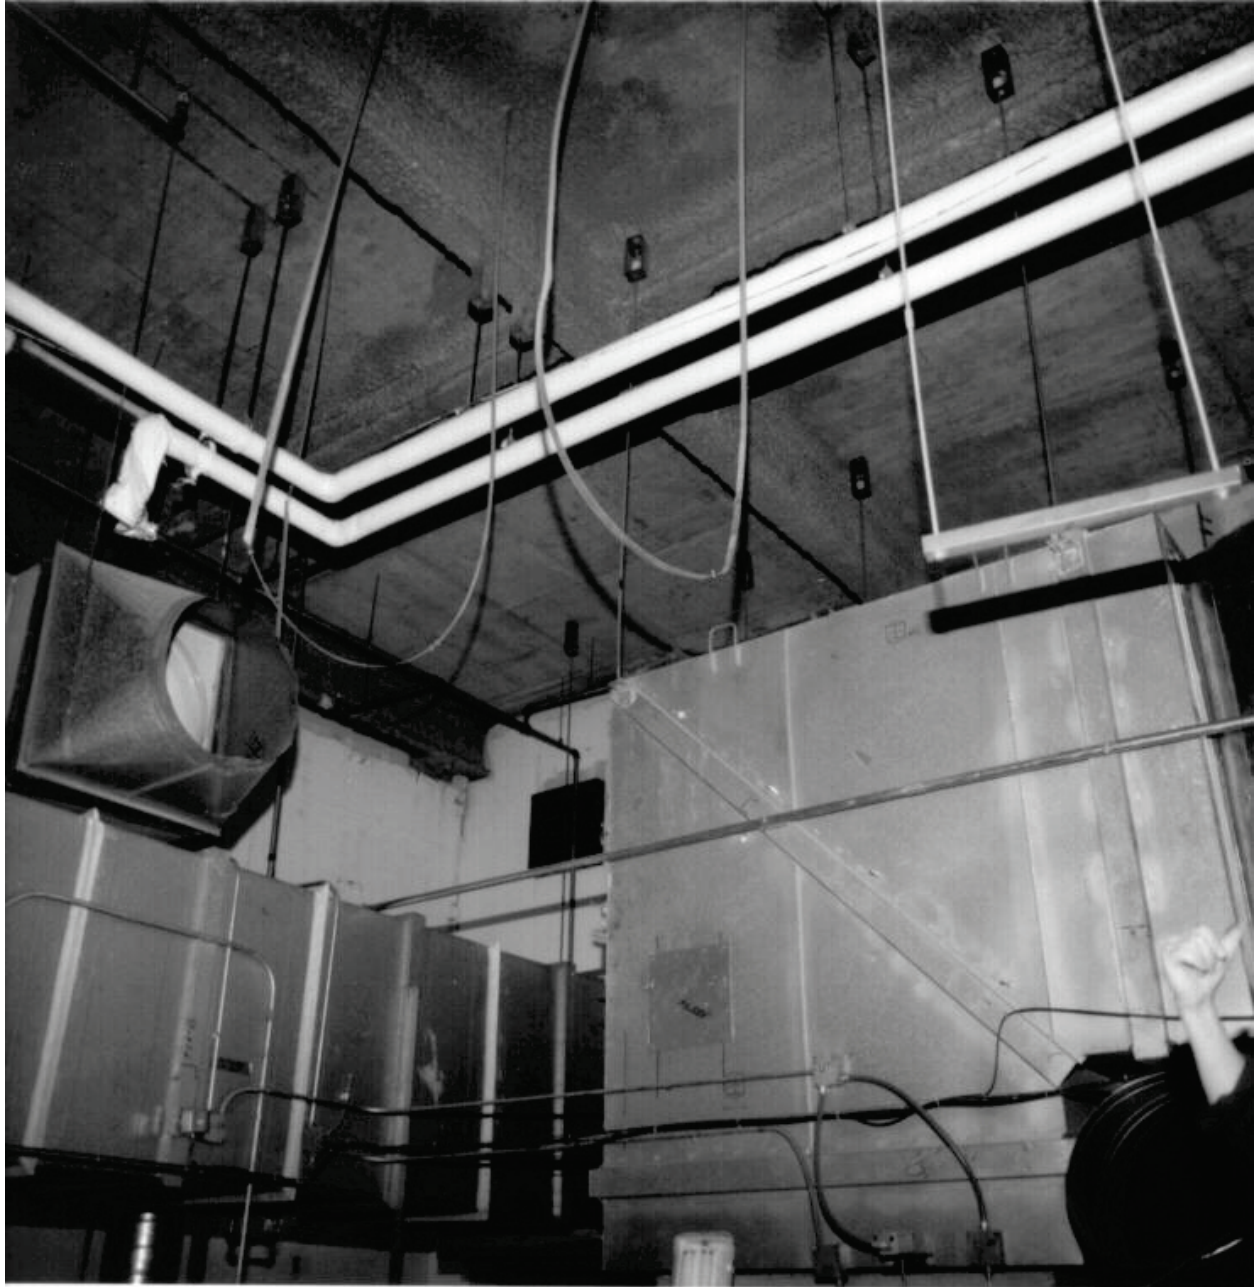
Collapsed unbraced ducts and hangers dangling from floor above in the 1994 Northridge Earthquake (Photo courtesy of Mason Industries).
